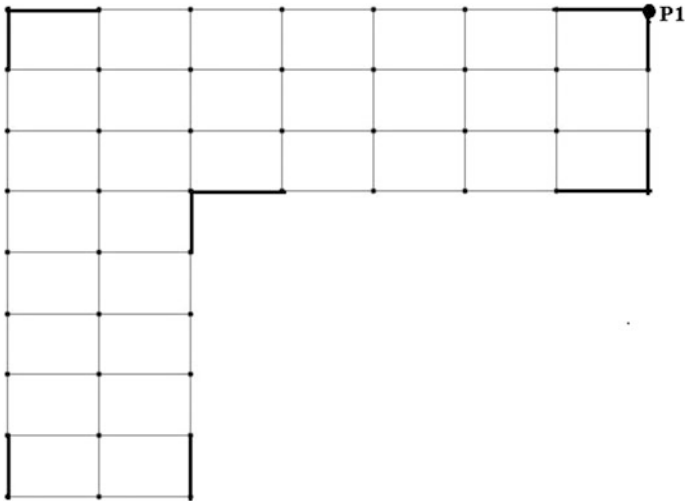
VED positions in PLAN for L shape building (7 bays of 6 m in X and 8 bays of 4 m in Y)
